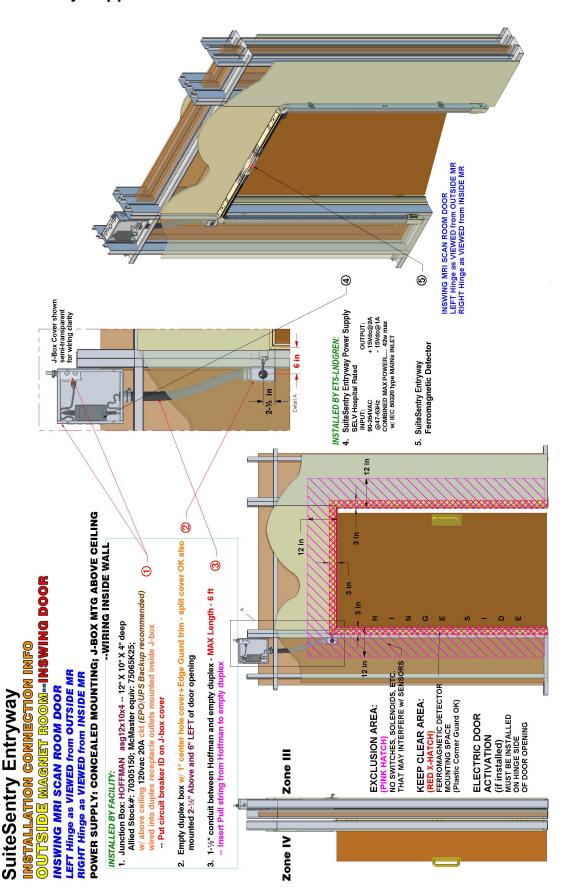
Facility Wiring OUTSIDE MR, INSwing, L Hinge Door, PWR SUP in Ceiling Mtd J-BOX
